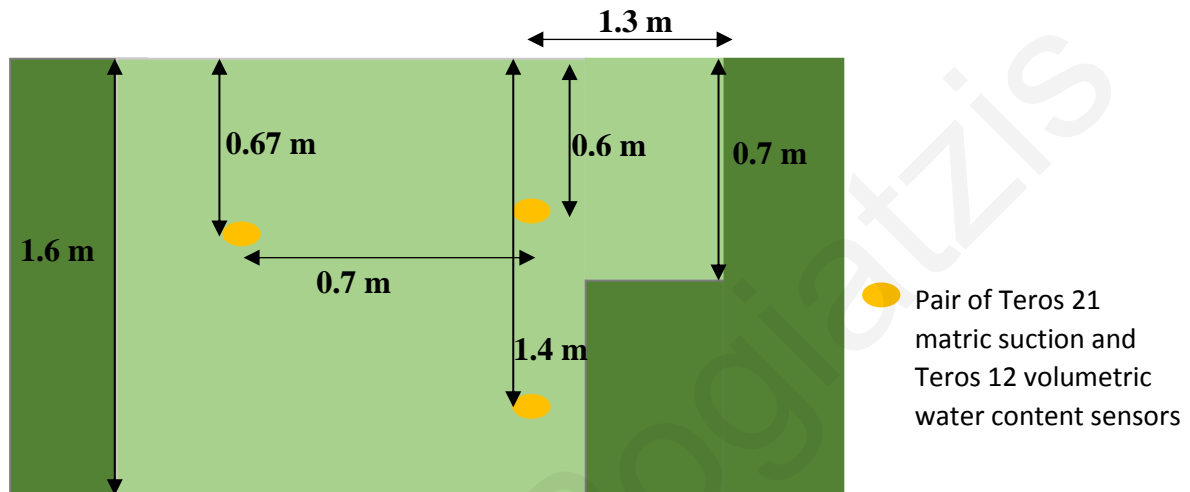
Schematic of the arrangement of the installed ground sensors at the side wall of excavated test pit 2.
